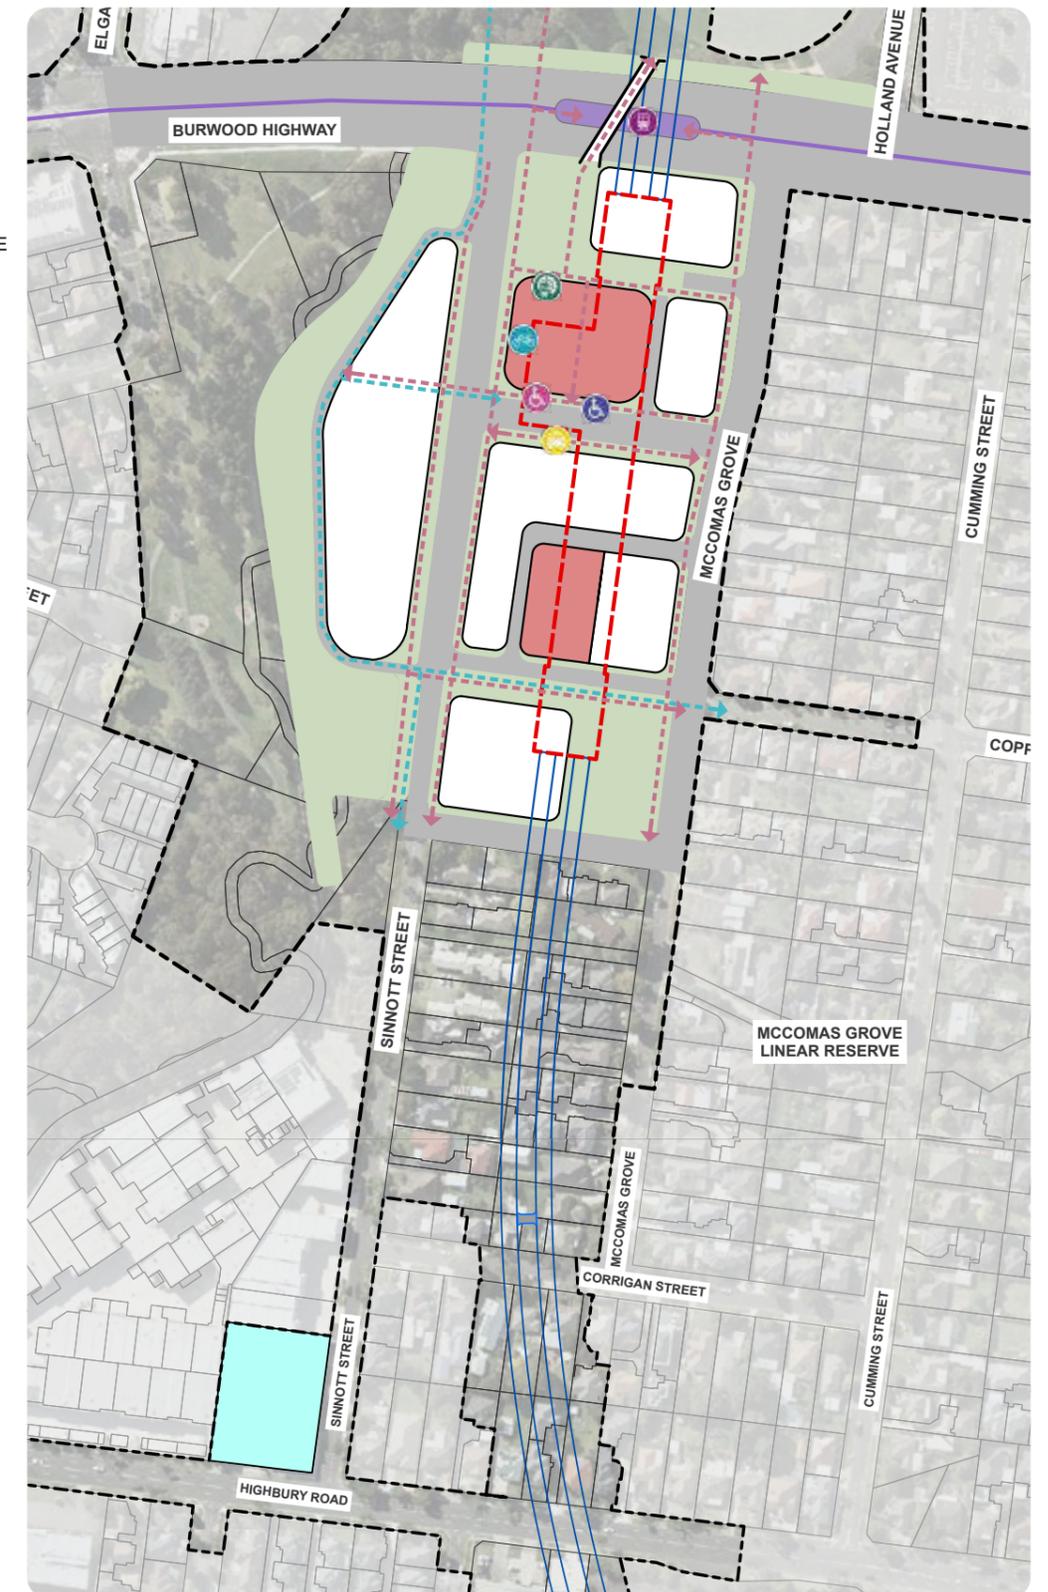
Excerpt from approved SRL Surface and Tunnel Plan
